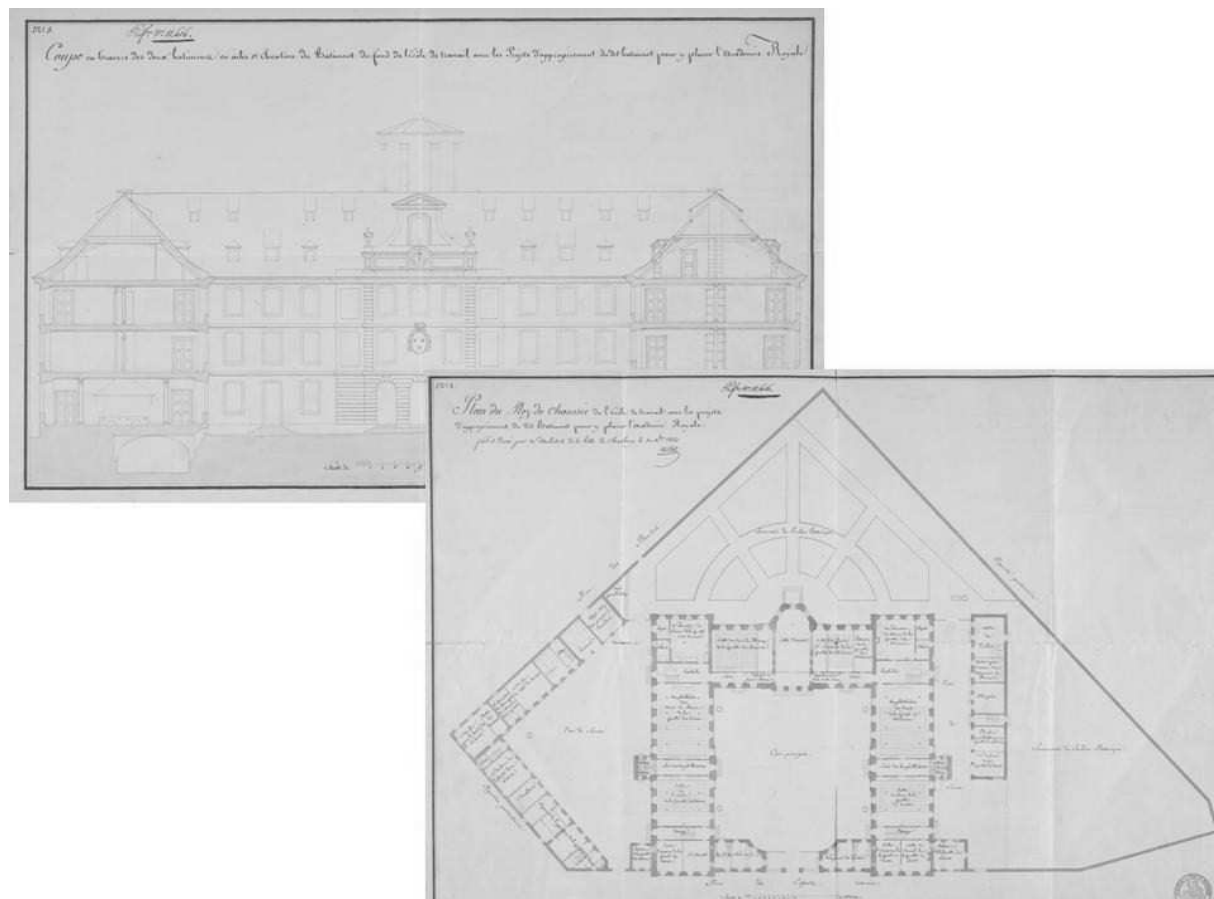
Sketch by Architect Villot (dated 30 Oct 1824) of the Academy façade and ground floor layout of the main building and of the dependences, still existing today. (© AVCUS)
